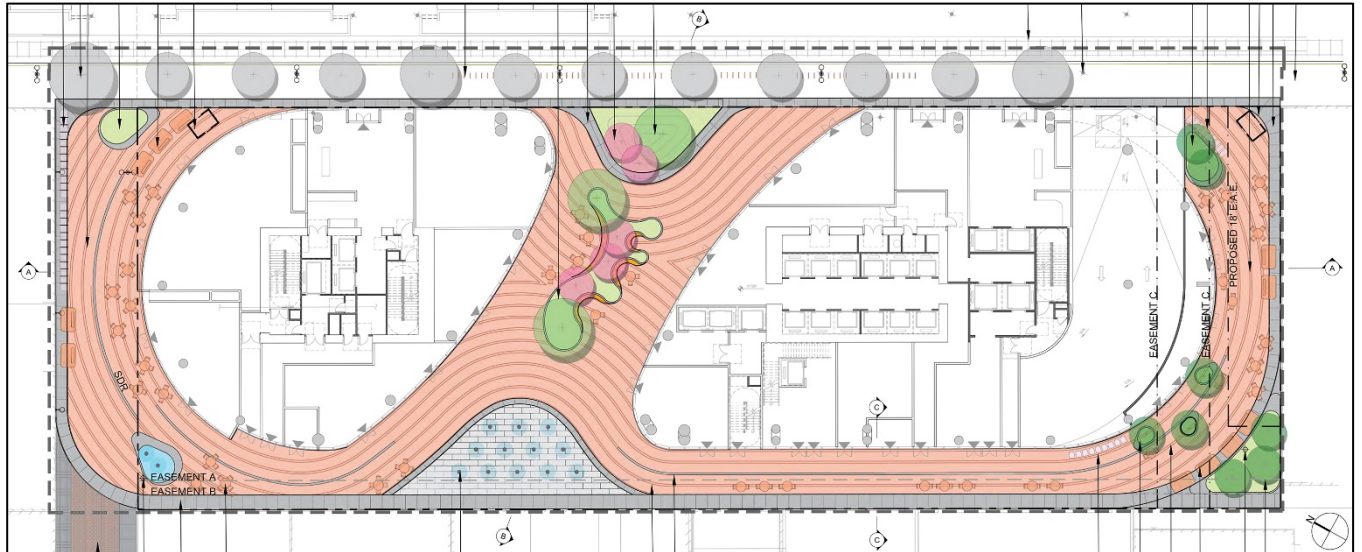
The proposed plan of the street level (edited from Bjarke Ingels Group).
